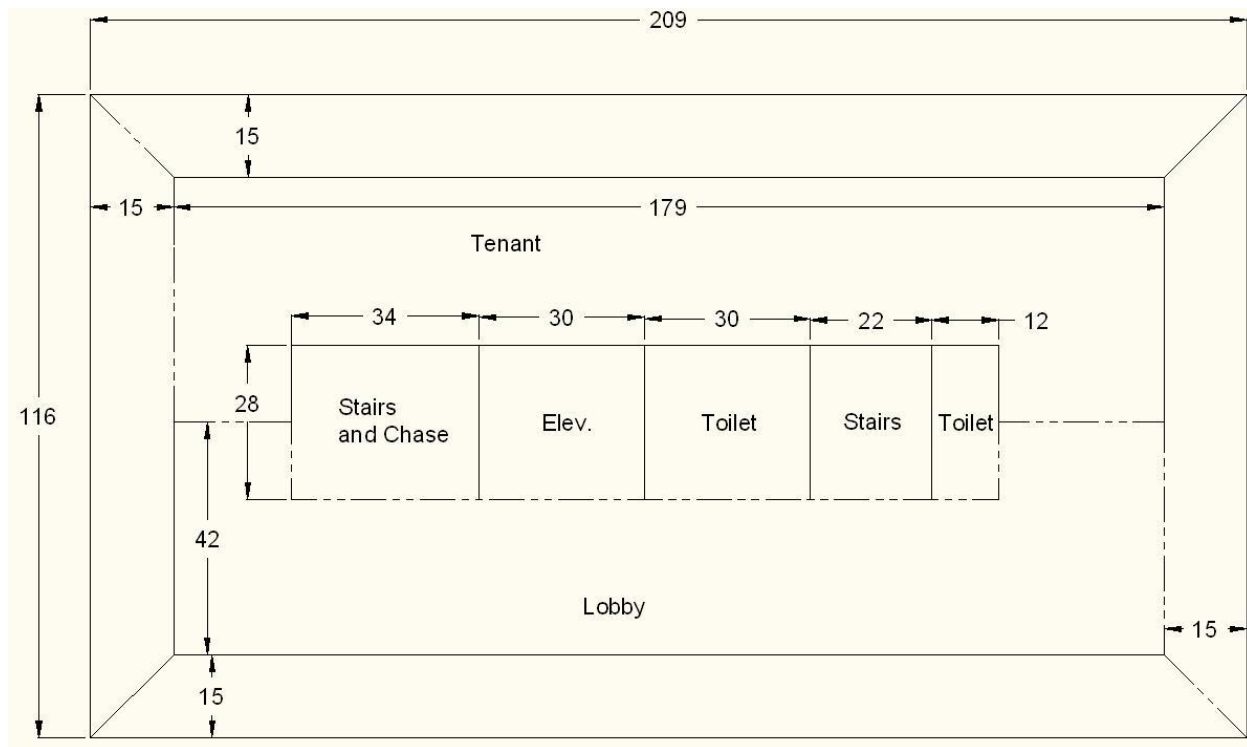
Ground floor plan of core and perimeter zones (Case Study III).
